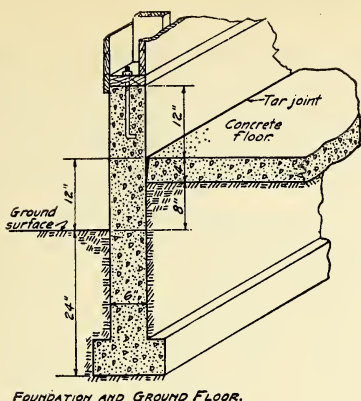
Buildings where food is to be kept should be made ratproof with concrete foundation and floors.
